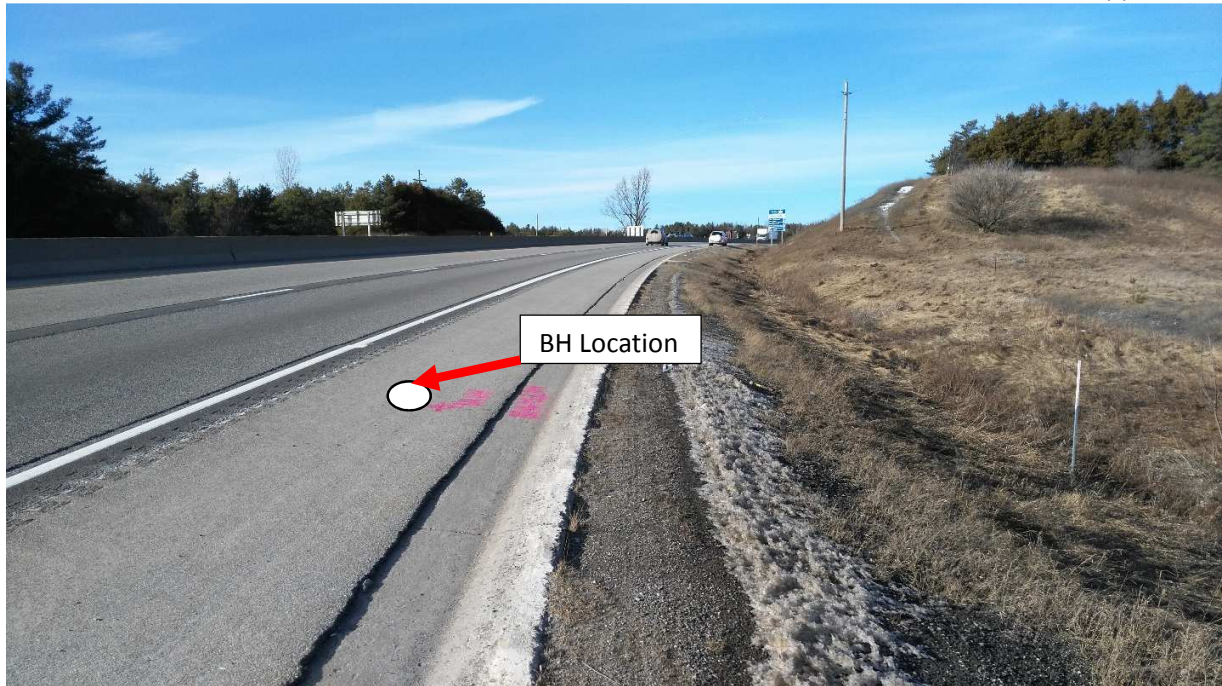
Facing North, North Bound Shoulder (BH16-1-1 location)
